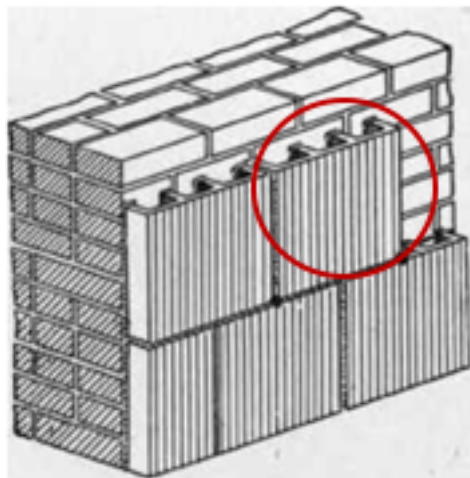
Tile Furring Attached to a Brick Wall<sup>5</sup>
